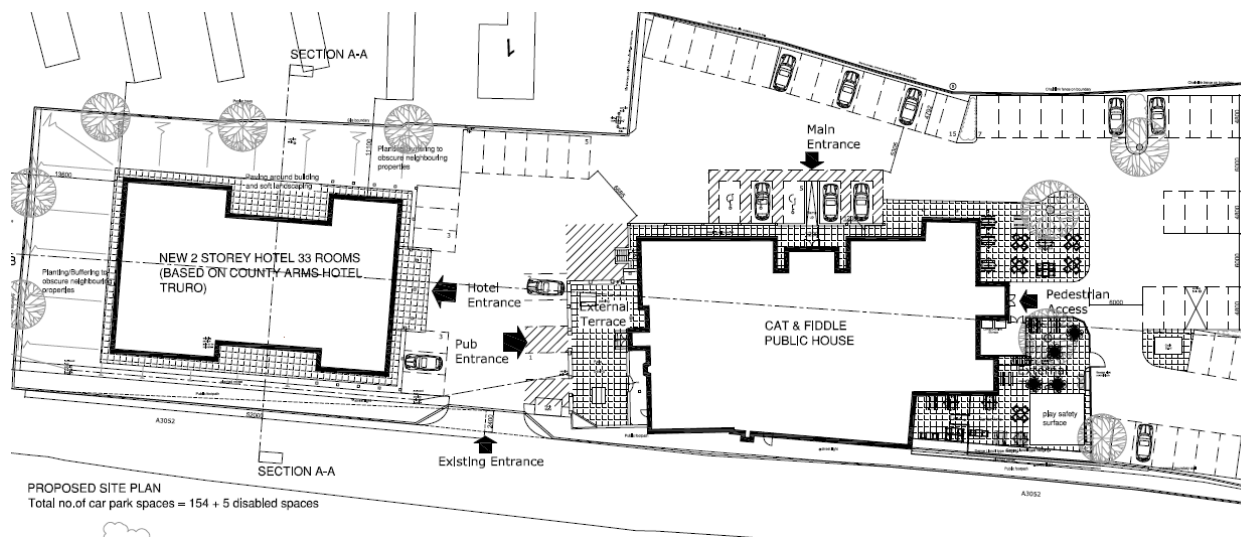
Extract from Proposed Site Layout Plan, Design Management Partnership Drawing No: 16.011-203
